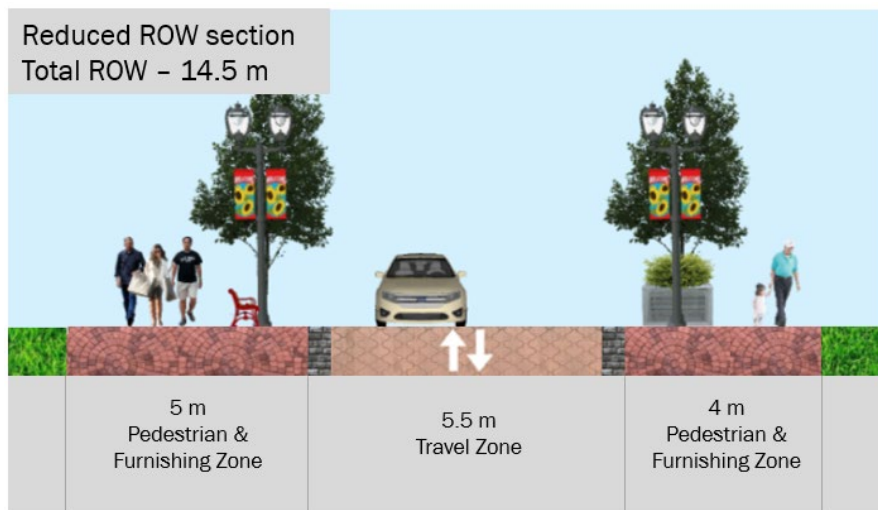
TYPICAL CROSS SECTION OF THE REDUCED RIGHT-OF-WAY SECTION
